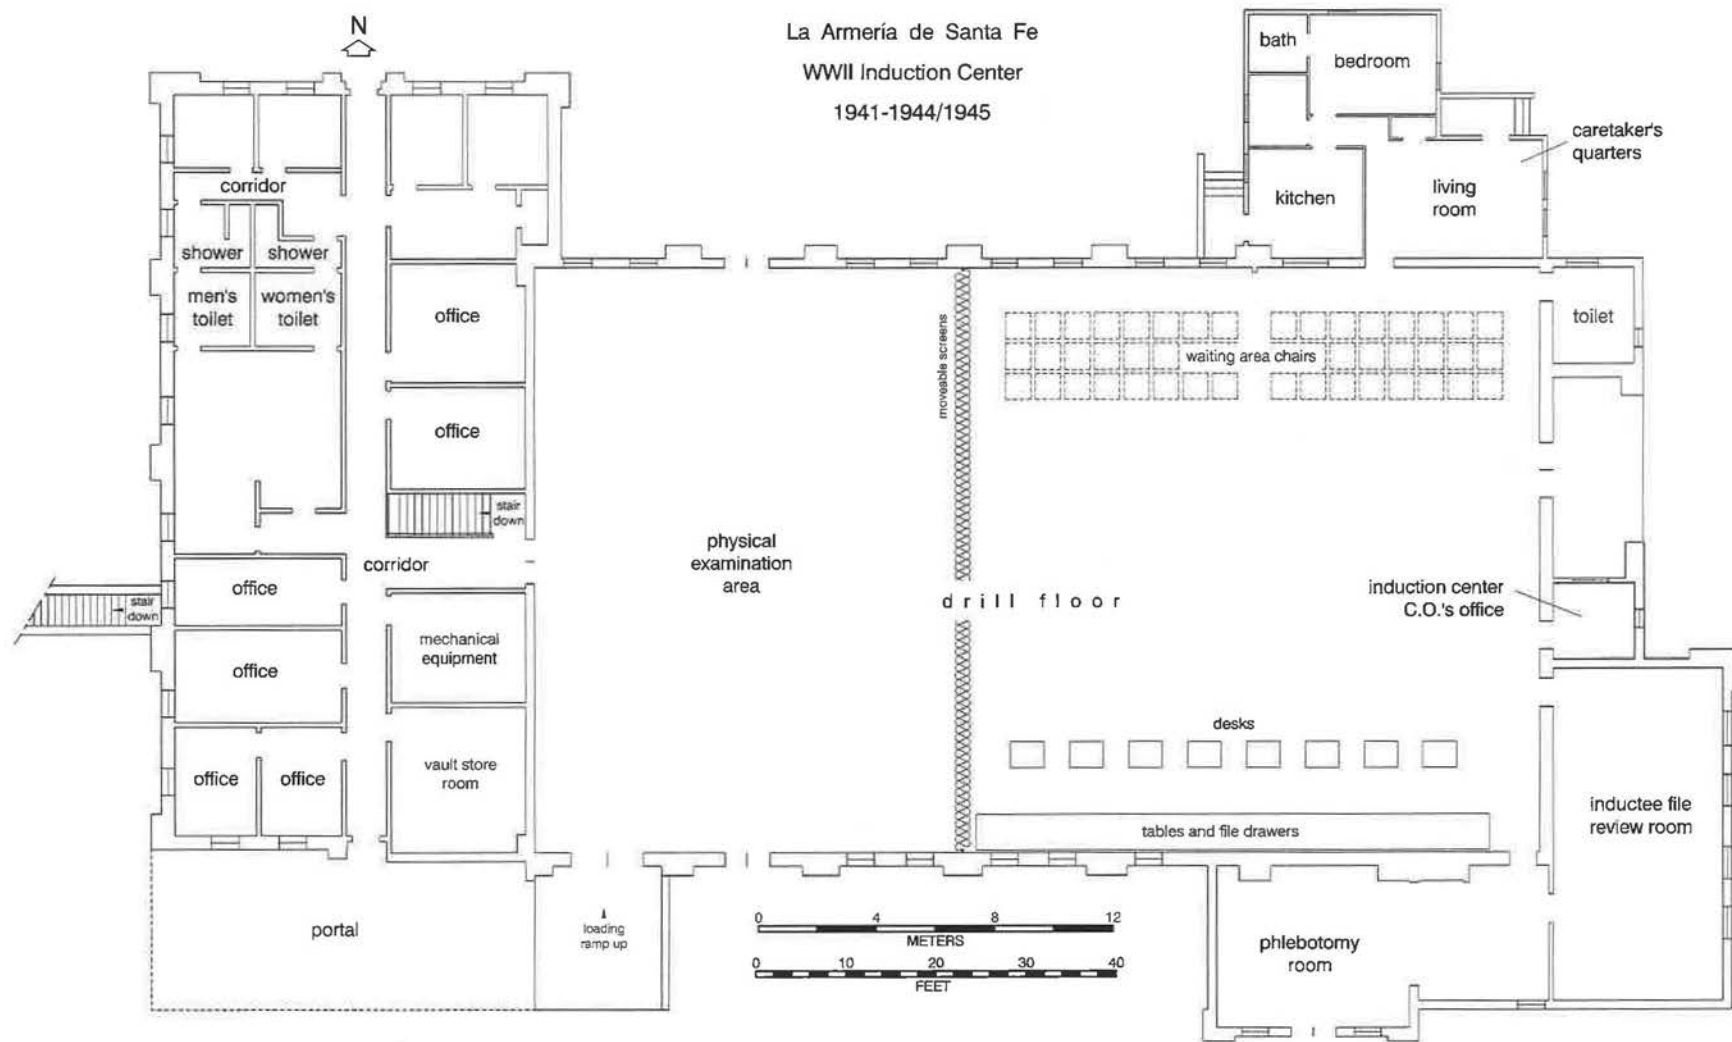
Floor plan of Induction Center, Old Santa Fe Armory
